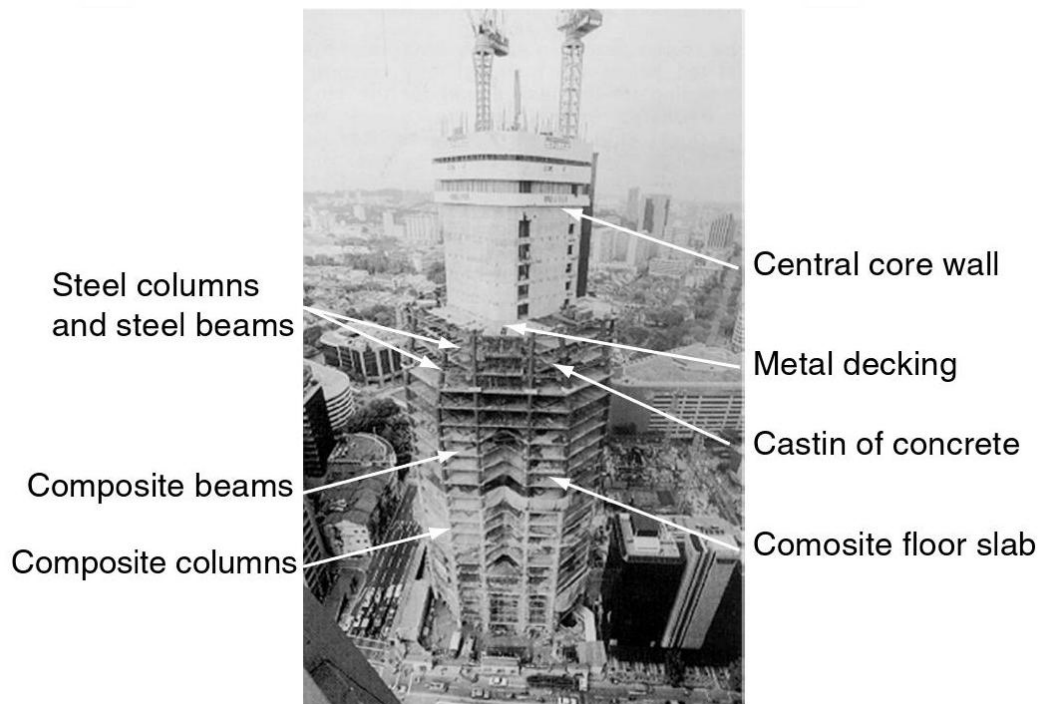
High-rise building under construction (Liew and Xiong, 2012)
